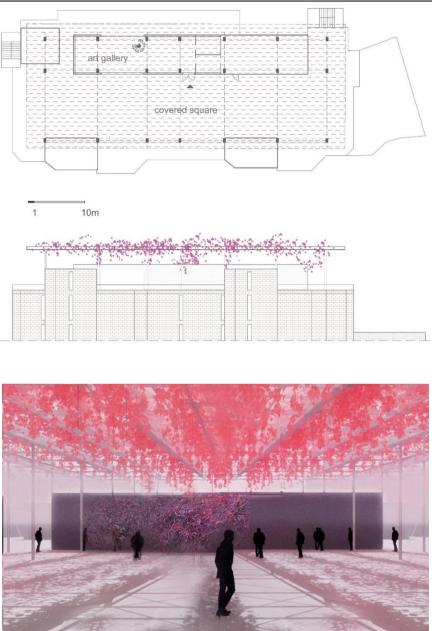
Plan, elevation and conceptual 3d view of rooftop extension: Source: authors
